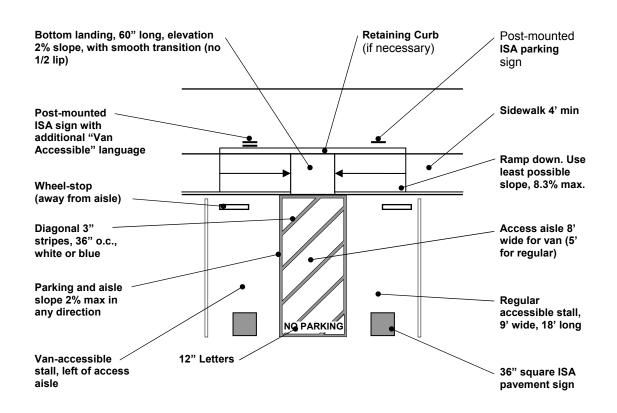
A. Depressed Curb Ramp at Accessible Parking (Typical)
